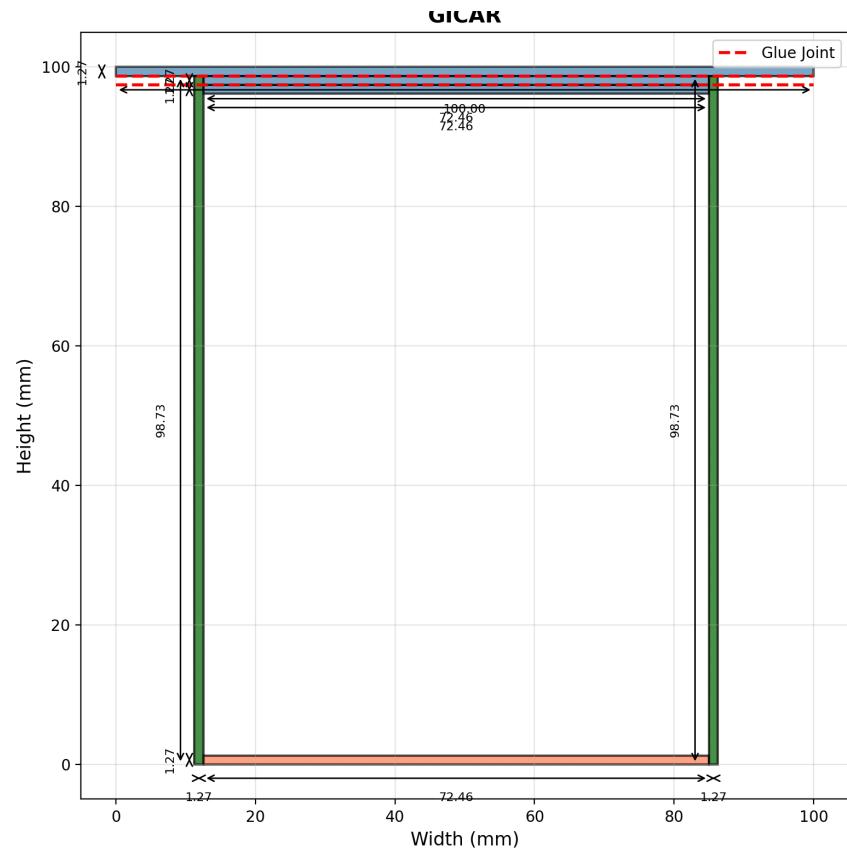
Matplotlib rendering of cross section (note this does not show the 'wrapped' design, but is to scale)
